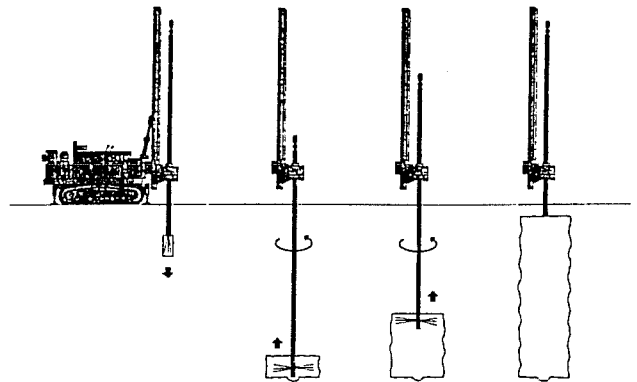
Installation method of consolidated soil columns by V.H.P.-grouting
